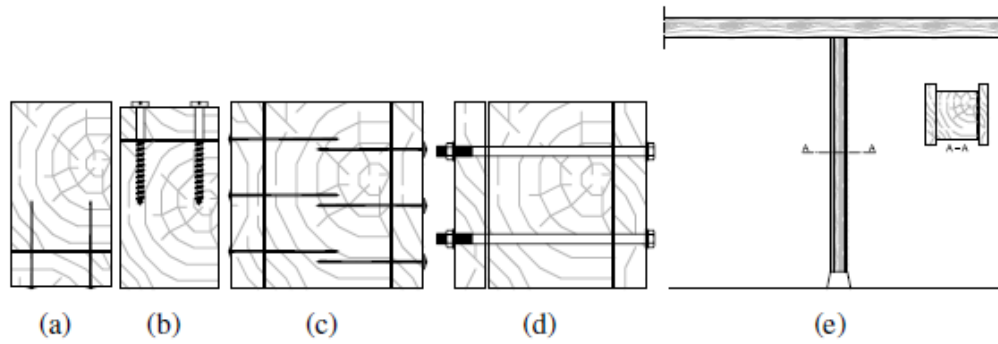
Examples of transversal section increase – reinforcement. a) nailed connection; b) tapping screws connectors; c) nailed connection; d) bolt connectors; e) column reinforcement; [11].
